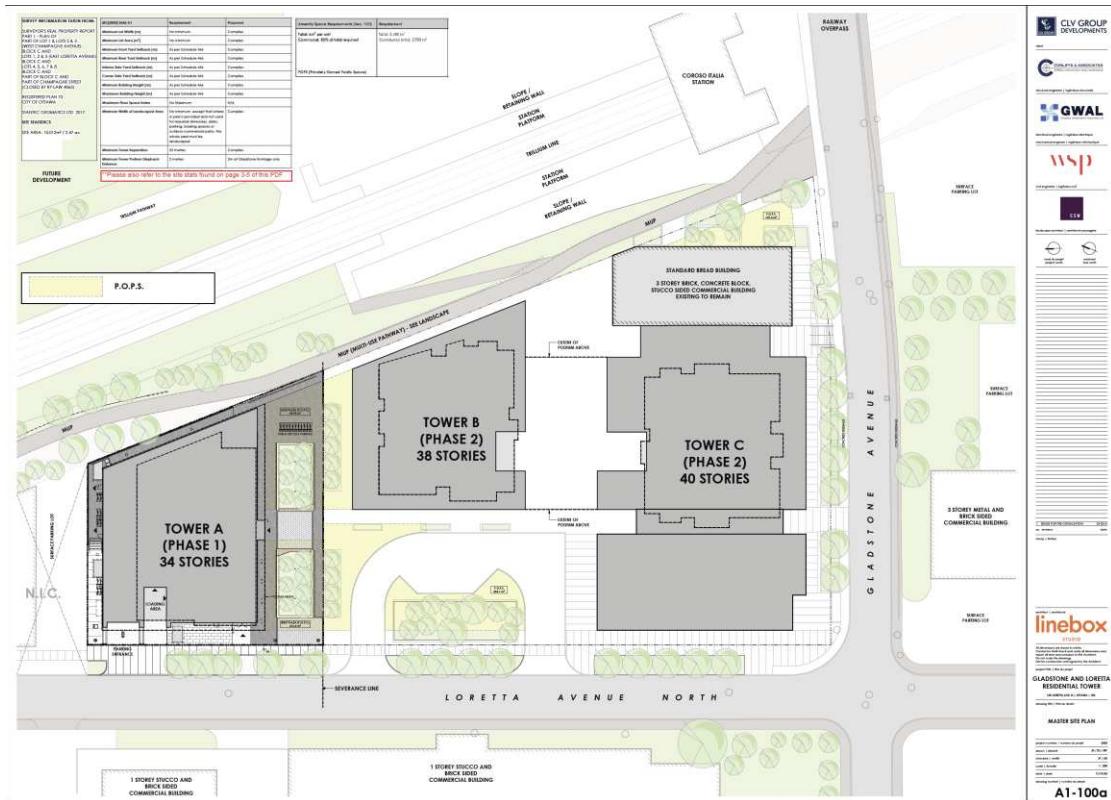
Revised Site plan of the proposed development illustrating its relationship to Gladstone and Loretta Avenues and the O-train corridor with 34 storey Tower A (Phase 1), with the 38-storey Tower B and the 40-storey Tower C both planned as Phase 2. The designated Standard Bread is next to the O-train corridor. Source: Linebox Studio. 2025.
